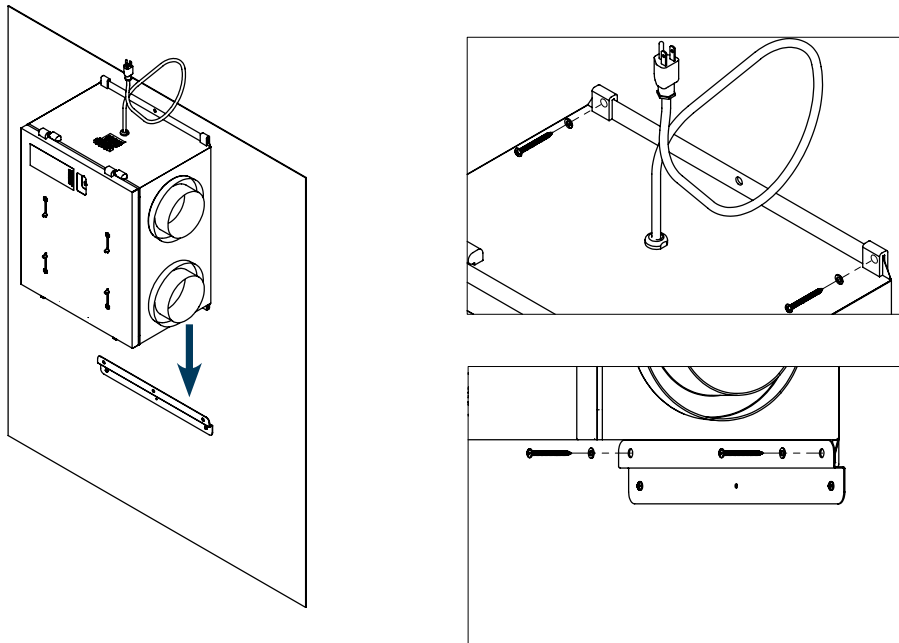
UNIT MOUNTING STEPS CONTINUED
